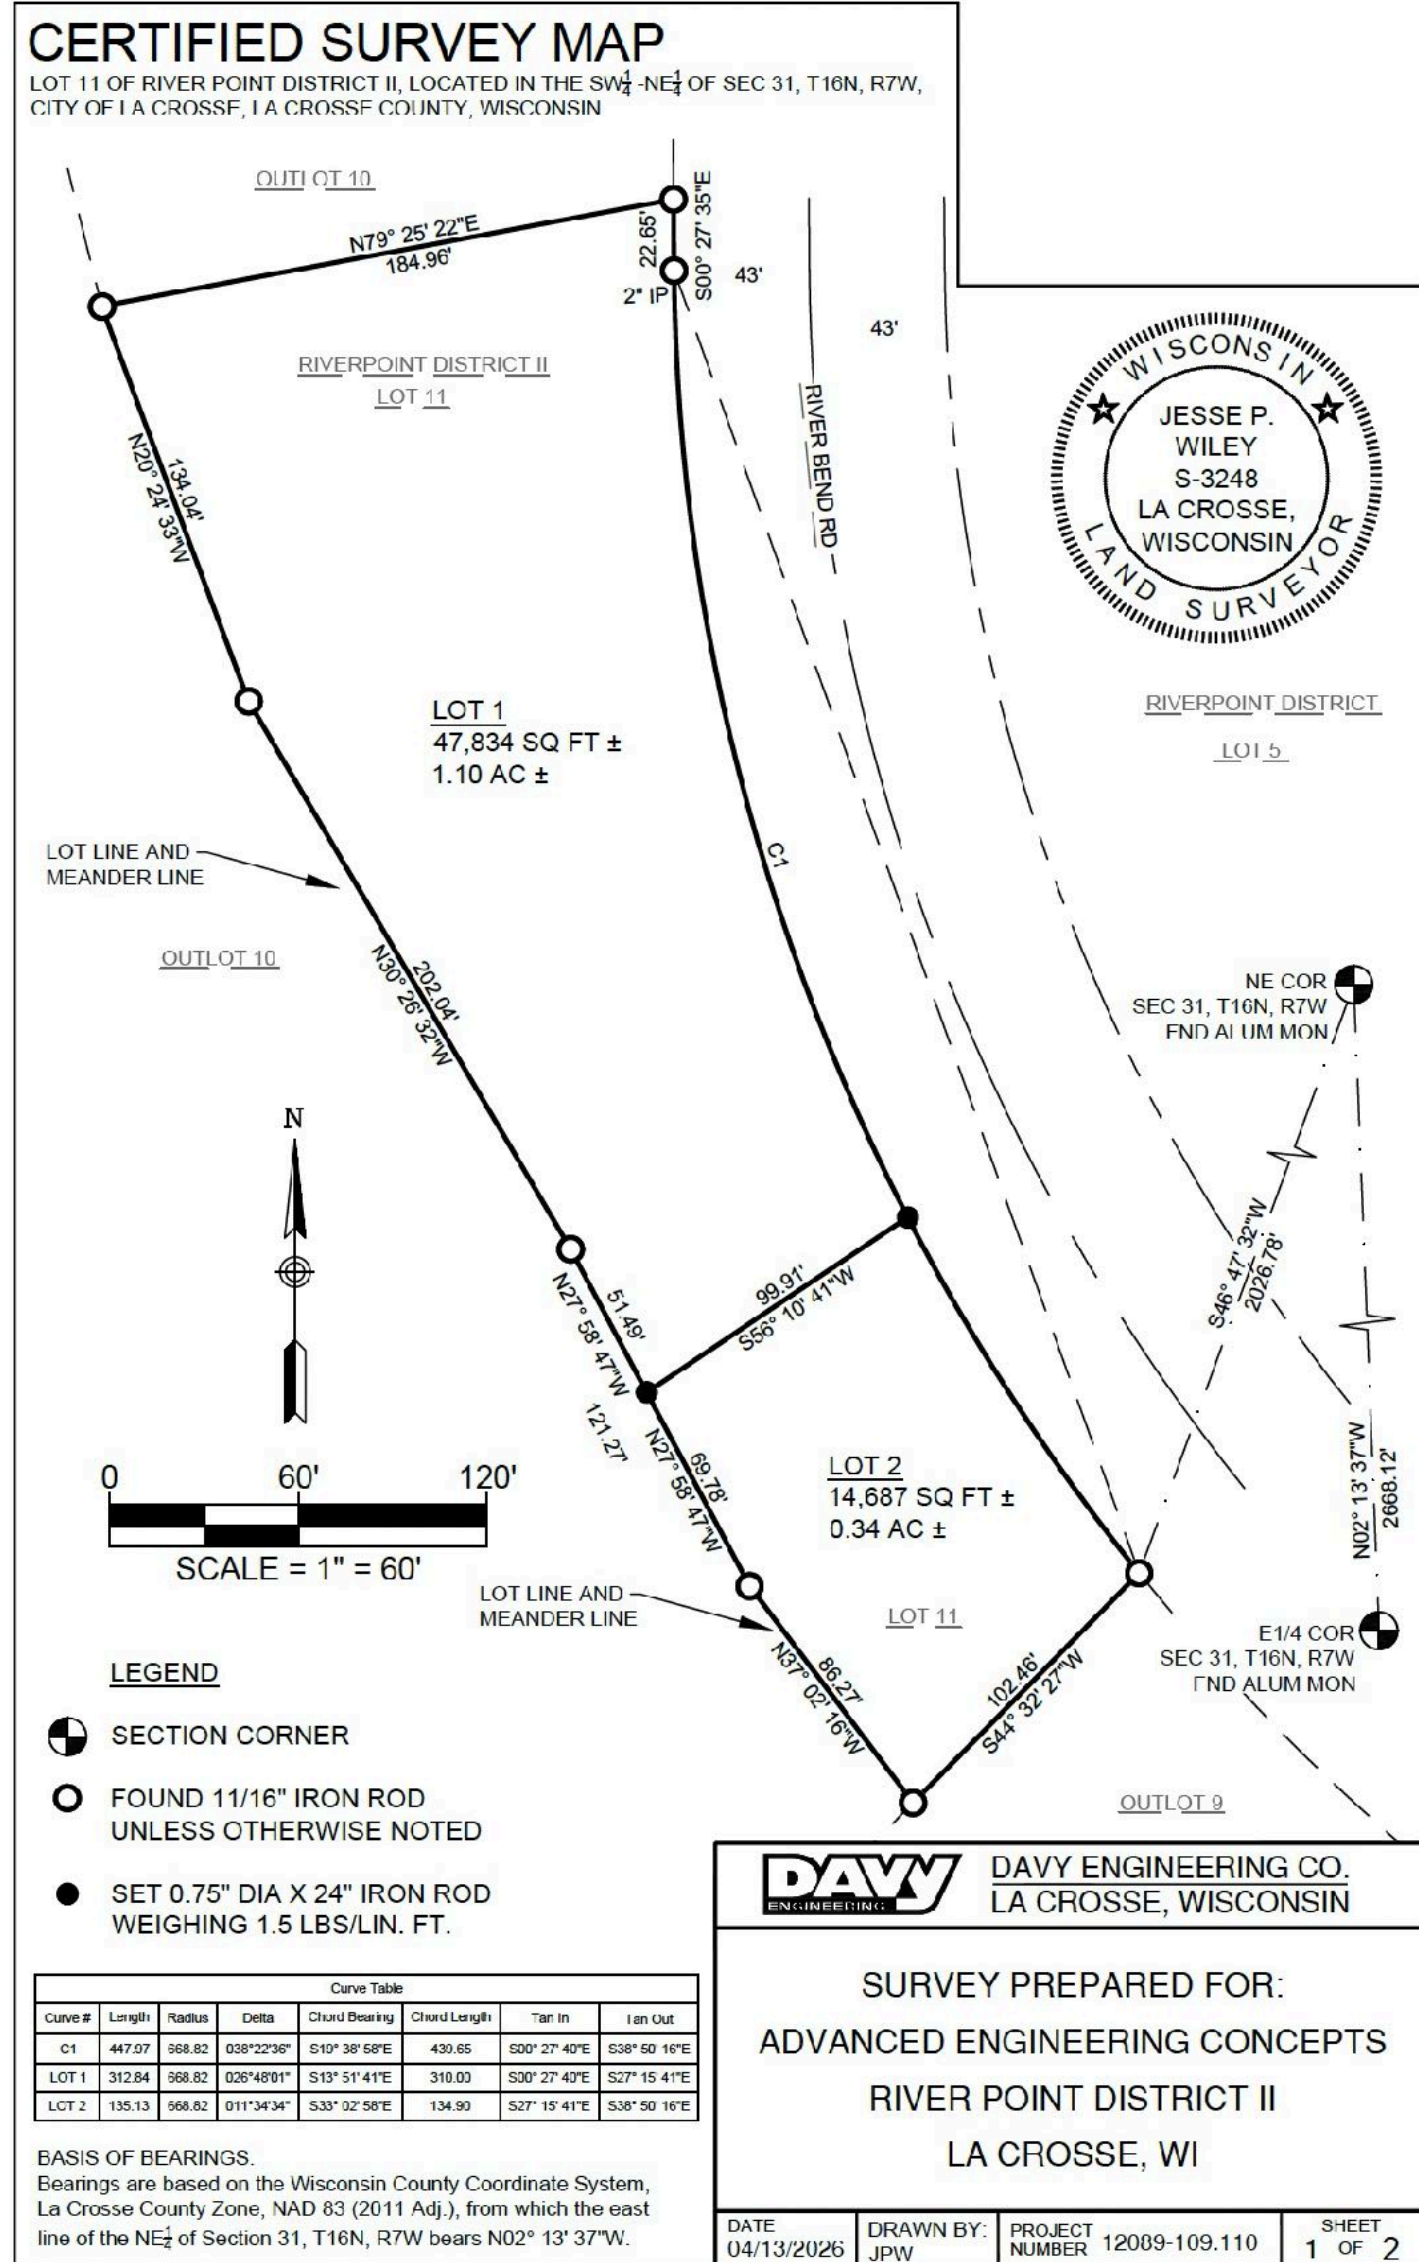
Site plan with labeled zones corresponding to the development summary.
